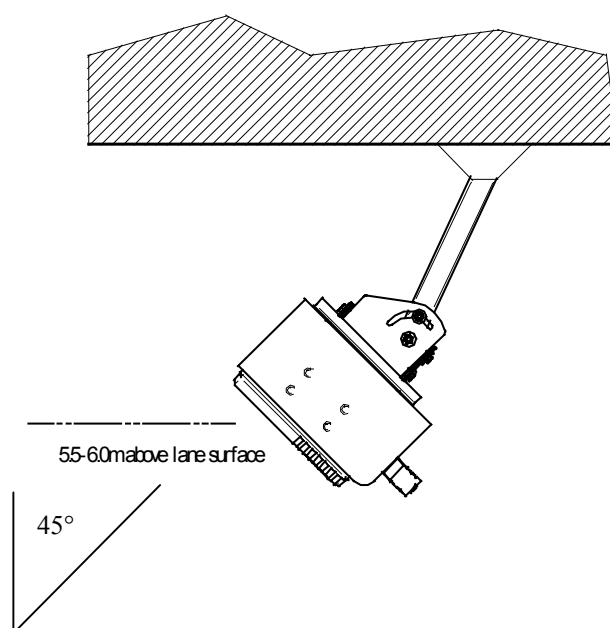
Side view of MR mounted hanging from concrete superstructure
